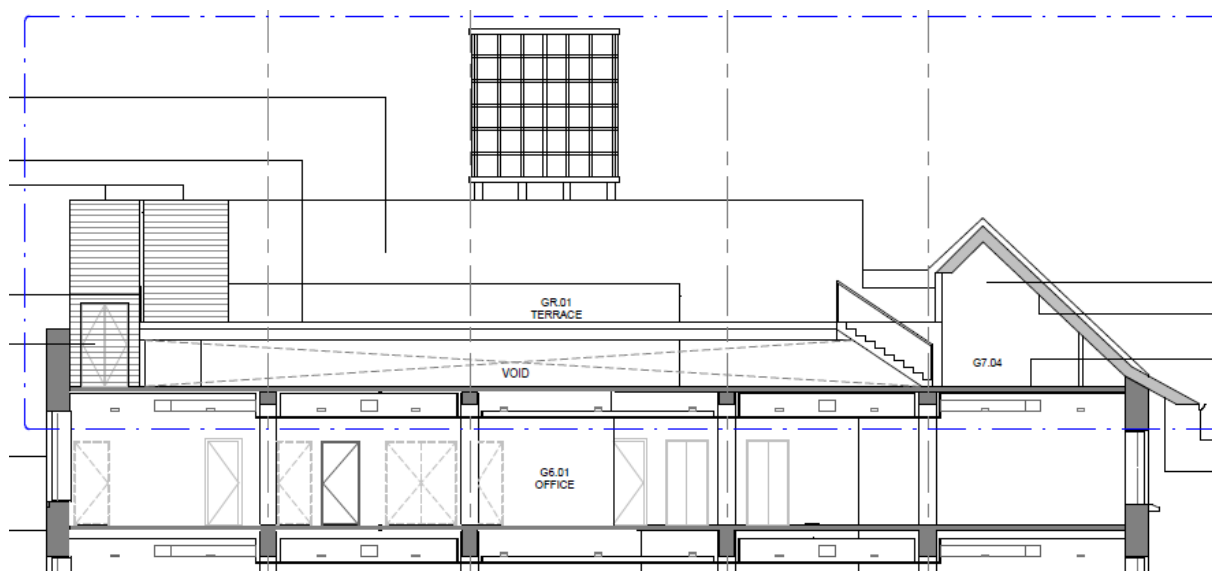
Section showing approved roof works at the rooftop level. (Source: Make, drawing number -A-285-21-32-1, October 2016)
